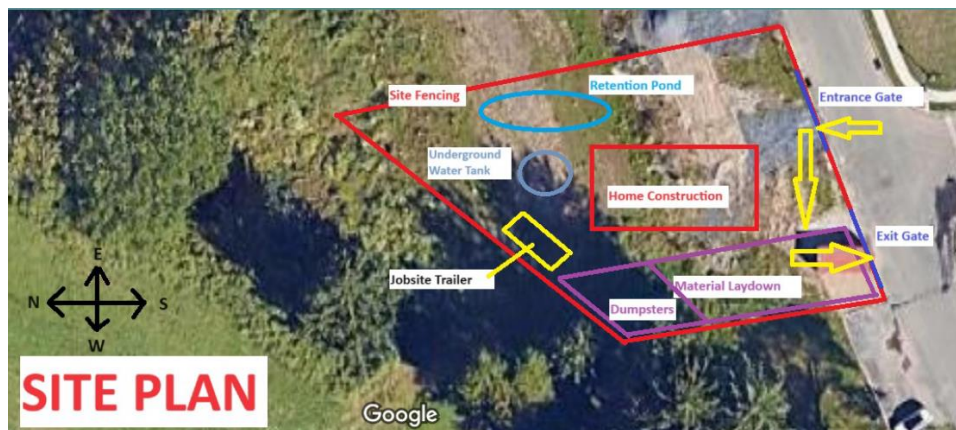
A Site Plan of the Green Building Project Designed by a Student Team
